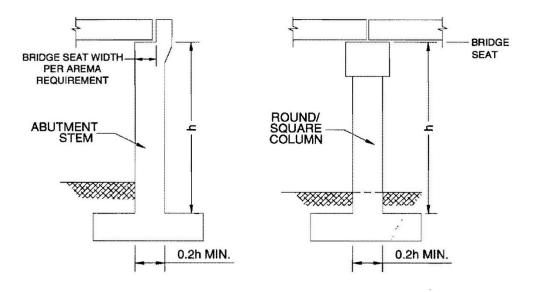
ABUTMENT AND COLUMN REQUIREMENTS
